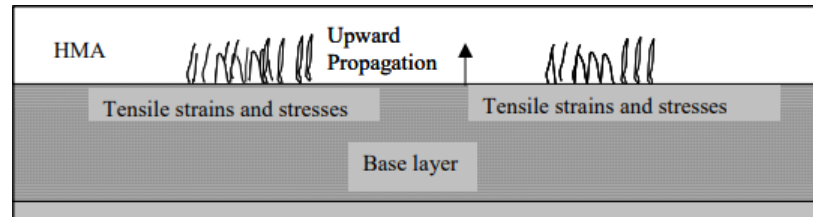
Bottom-up fatigue cracking.
